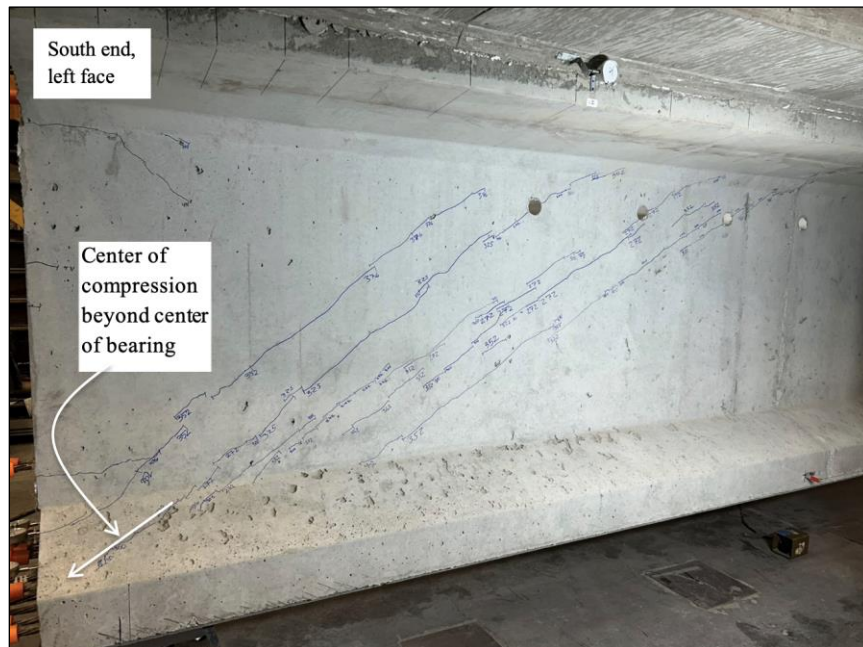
Photo. Test 3.2.S (repair 3.2RBF) final shear cracks on repaired face of the girder at 410 kip (left face of girder pictured).
